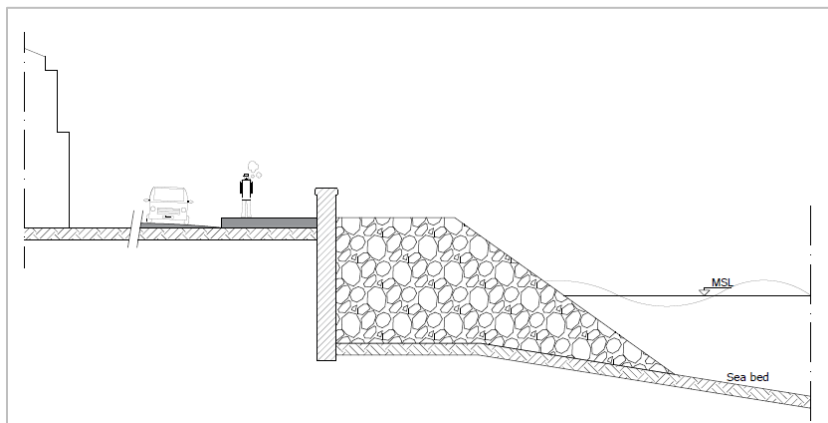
The berm alternative dimensioned in according to Córdova (2016)
